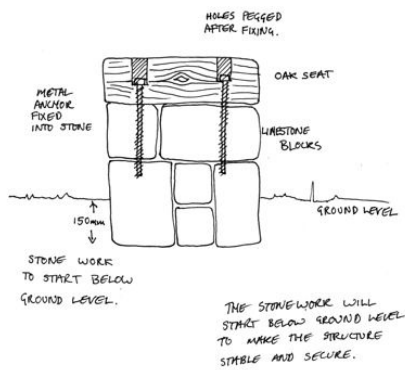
## DETAIL OF FIXINGS FOR TOPOSCOPE FRAME.
